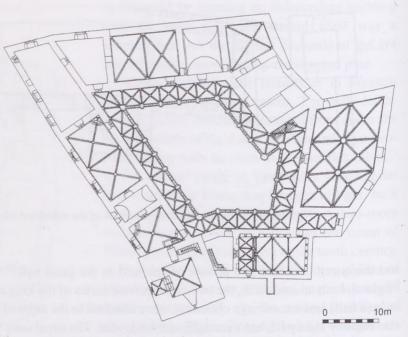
Ground plan of the upper floor of the Zvikov castle
